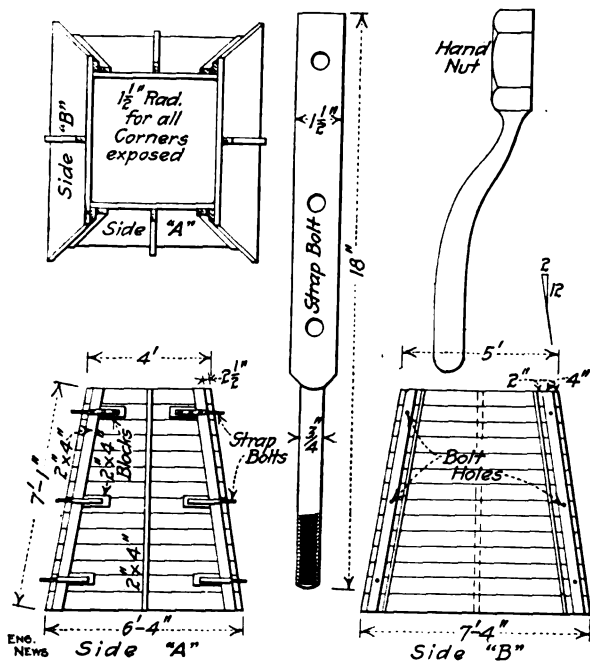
FORM CONSTRUCTION FOR CONCRETE PEDESTALS OF VIADUCT
